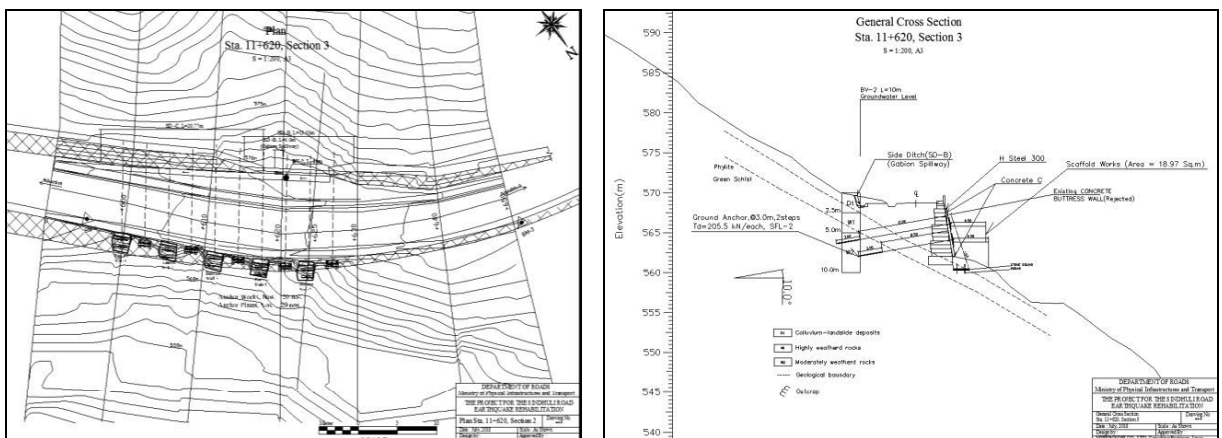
General Plan and Cross Section of the Proposed Countermeasures (Sta. 11+620)
